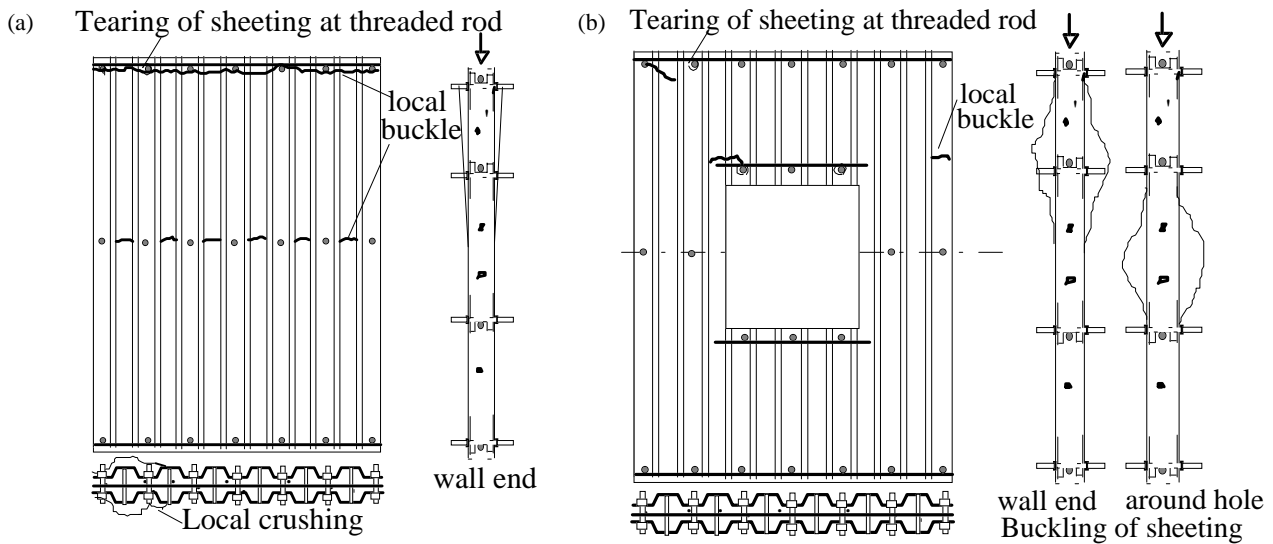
Buckling of sheeting in Spandek walls: (a) non-pierced wall; (b) pierced wall.
